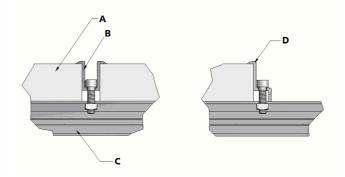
Module fastening of the TopFix 100 pitched roof mounting system
